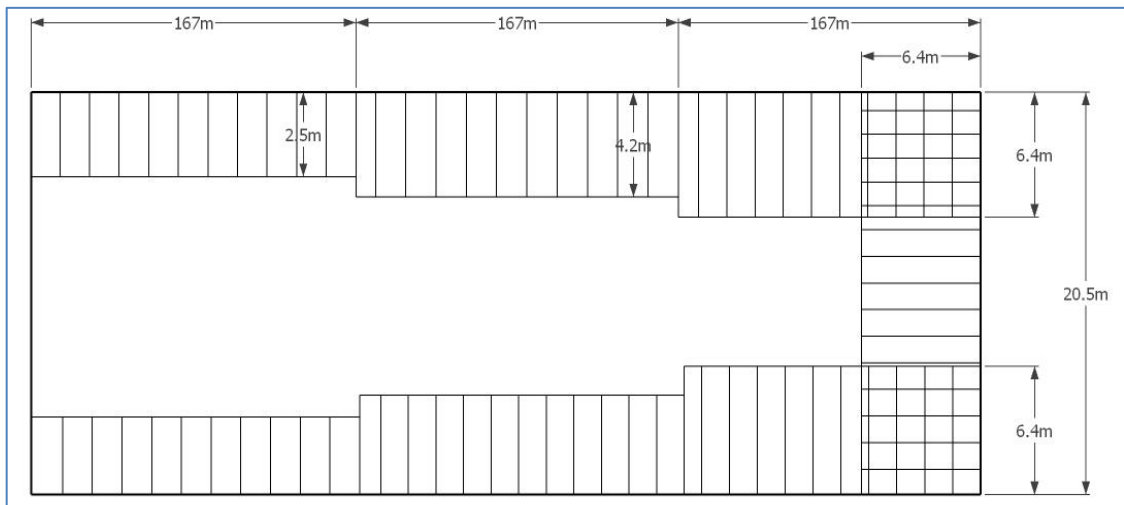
3 Horizontal alignment of reinforcements for MSE Walls 1, 2, 3, 12, 13, 14 (not in scale)
